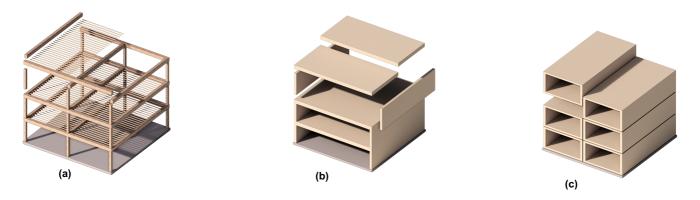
Construction methods: (a) 1D frame construction; (b) 2D panel construction; and (c) 3D volumetric construction.
